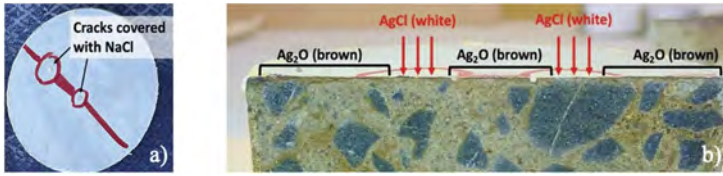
Specimen with small cracks: (a) before cutting and (b) after AgNO₃ spray.
